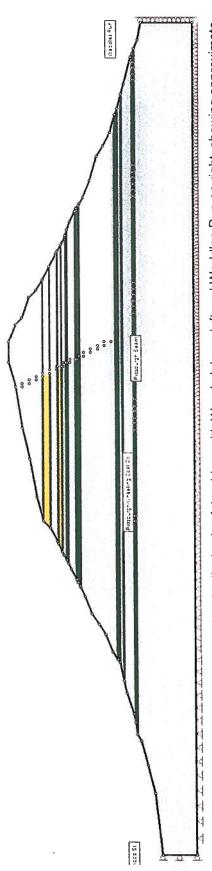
Cross section profile along the longitudinal axis of the ridge, with Woodsdale on left and Waddles Run on right, showing approximate stranged excavation (white space) in relation to original profile (purple line).
